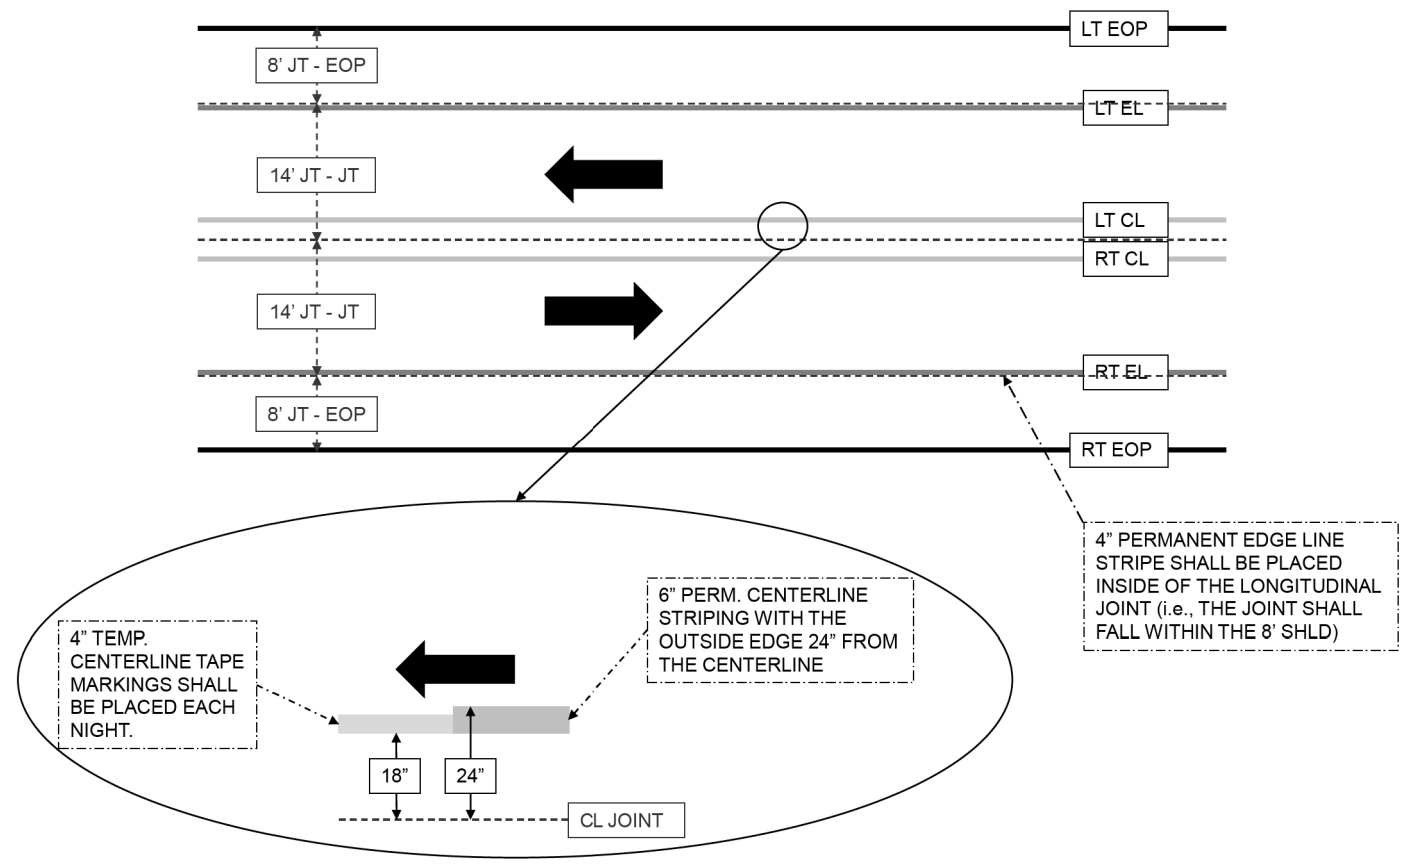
TYPICAL JOINT-PAVEMENT MARKING CONFIGURATION
